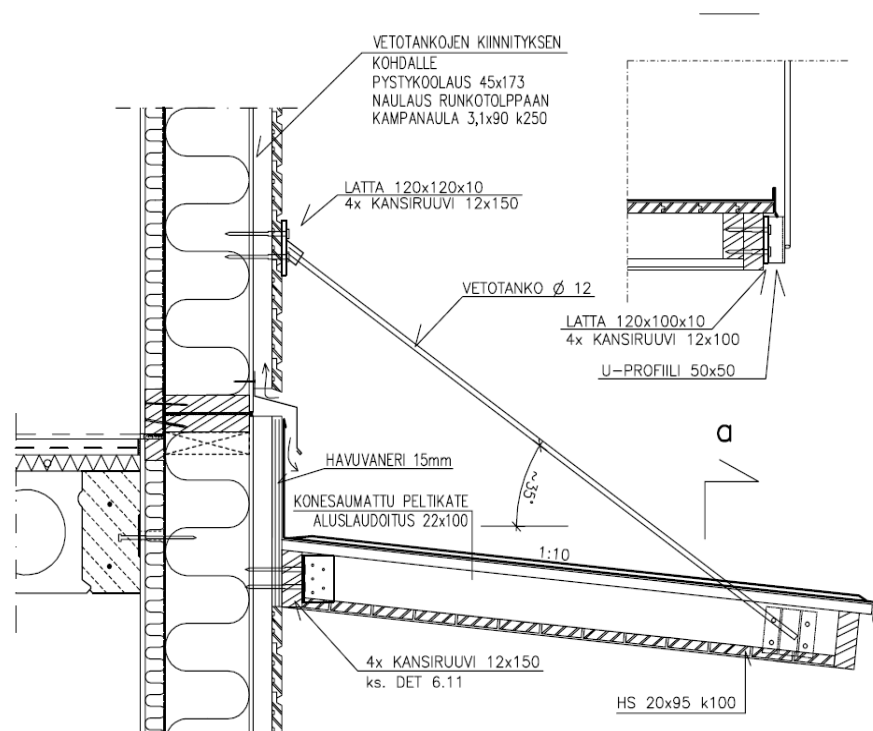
Detail drawing of a entrance canopy in D, E and F buildings. Nieminen A. 2014. Detail drawing 6.13.
